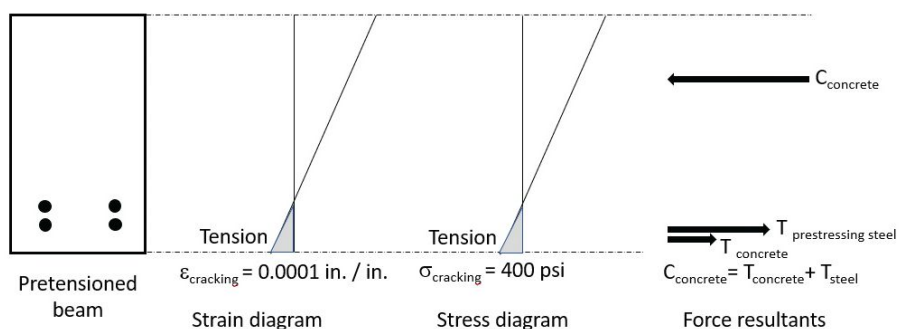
The strain and stress states at midspan of a pretensioned concrete beam just before cracking.
